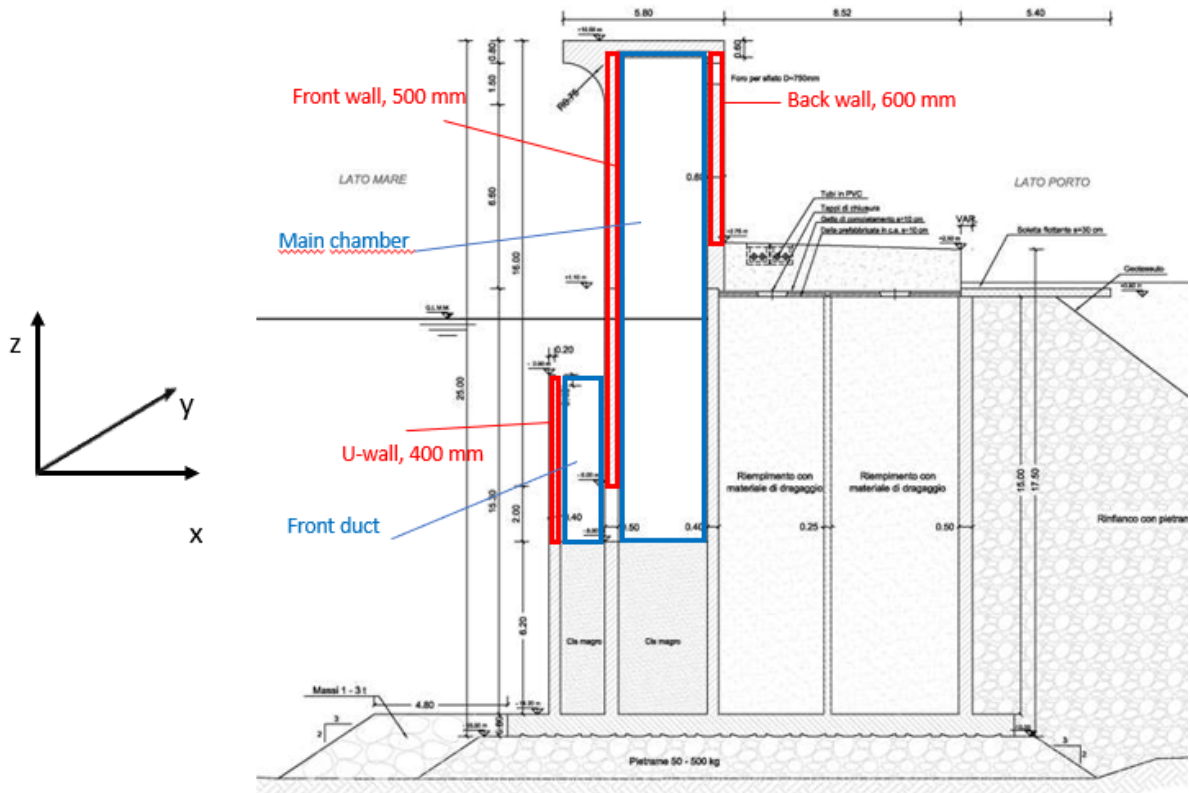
Cross-section of the REWEC3 caisson as built in Civitavecchia [4]
